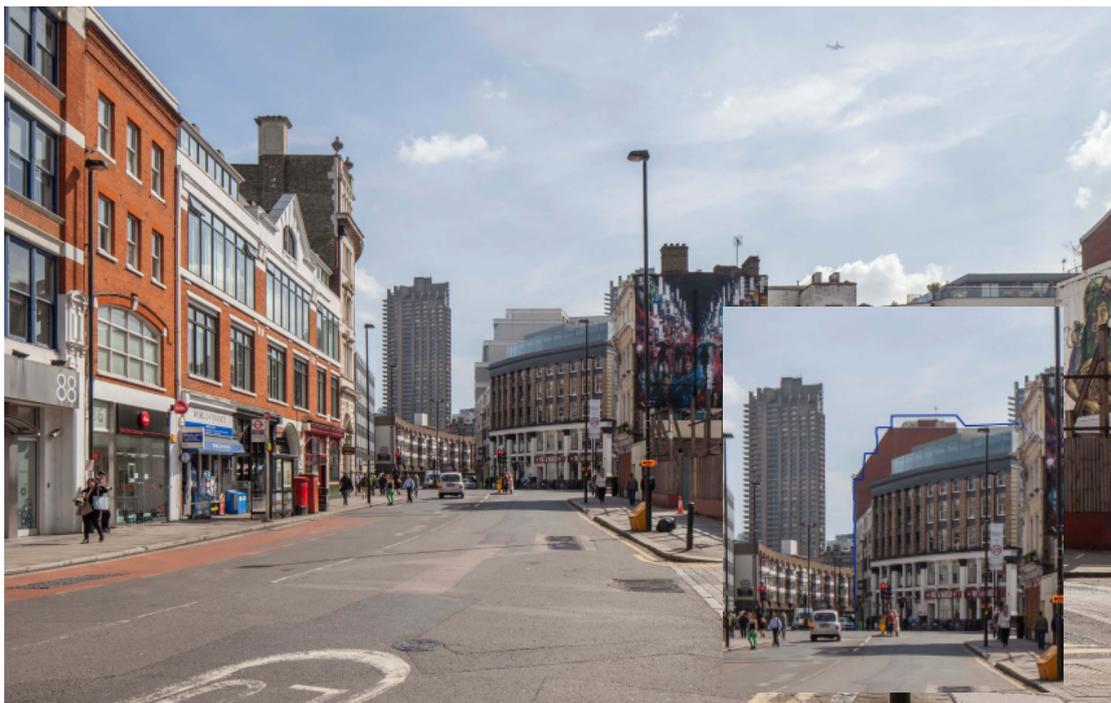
Proposed visual facing south towards the flank elevation of the proposal, with inset visual showing how it compares with the existing situation with blue line showing the proposal outline
